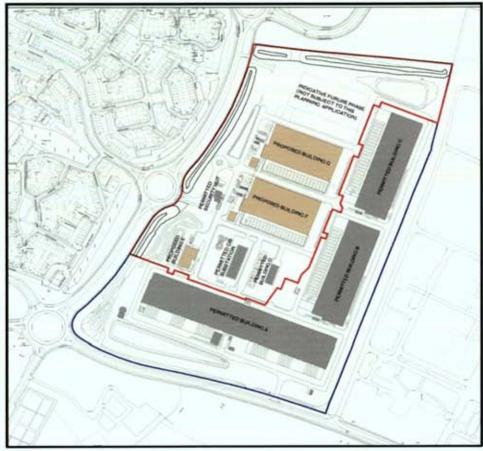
Extract from the Proposed Site Layout Plan (drawing number P-0010), indicating the location of the permitted, proposed and potential future buildings.
